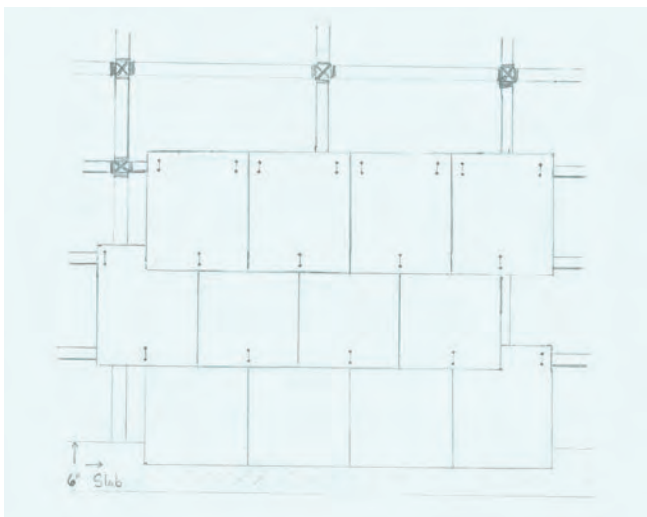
Plastic shingle siding should be drilled with 1/4" drill bit to allow for lashing. Begin at lowest rung of horizontal 1" bamboo and work up. Bottom shingle should overlap slab to allow for runoff. Shingles can be cut to fit for row endings.
